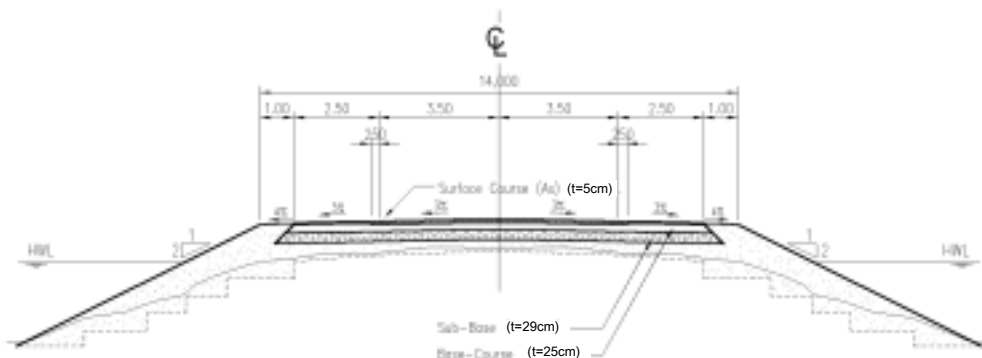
Typical Cross Section (Type E: Rural Section)
